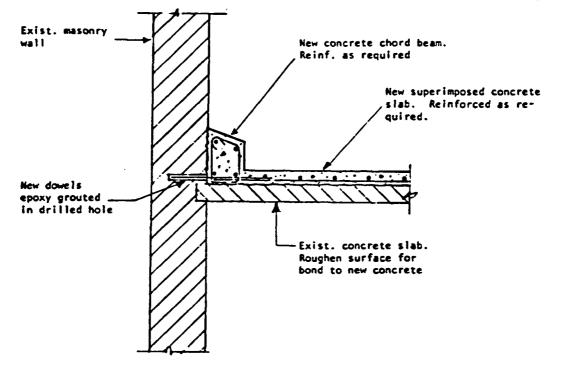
Superimposed diaphragm slab at an existing masonry wall
